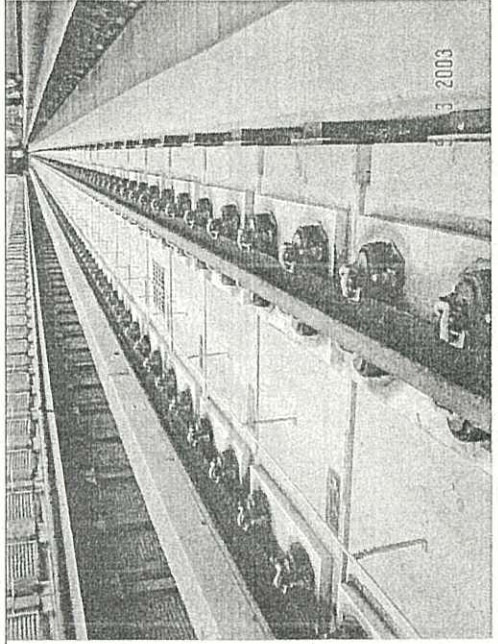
Rail Mounted on Baseplate at Floating Slab
